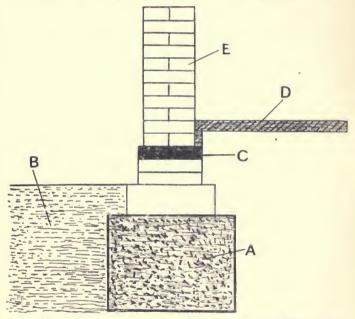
DIAGRAM SHOWING THE FOUNDATION AND WALL OF A BUILDING, AND THE MEANS PROVIDED TO PREVENT THE ASCENT OF DAMPNESS WITHIN THE WALL.
